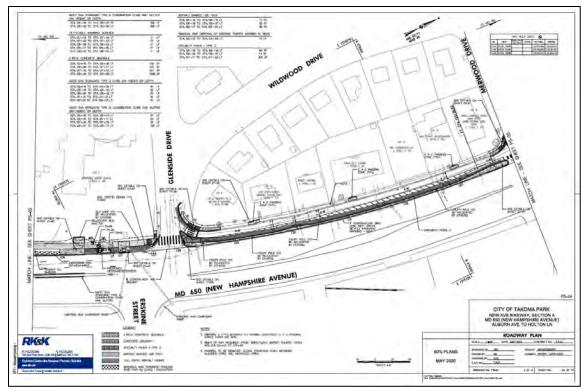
Plan View of Proposed New Avenue Section A Improvements (Part 4)
